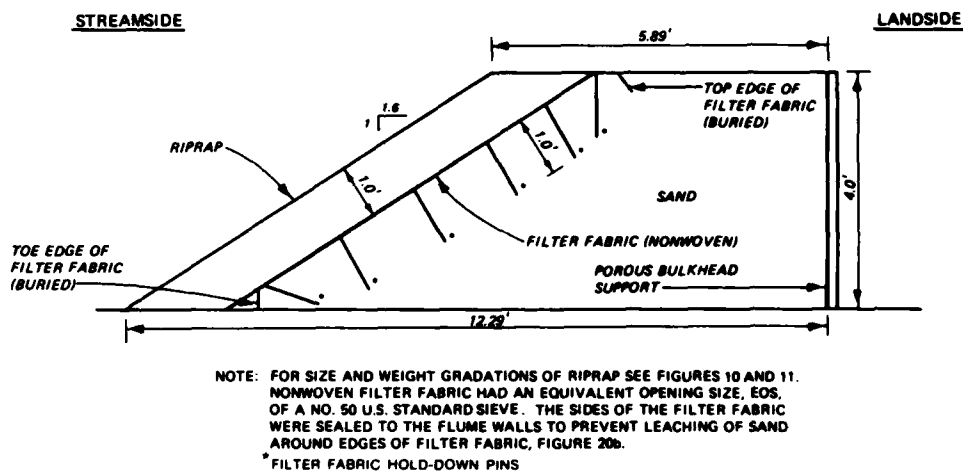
Plan 6A, sand streambank with 1.0 ft of riprap and nonwoven filter fabric protection
